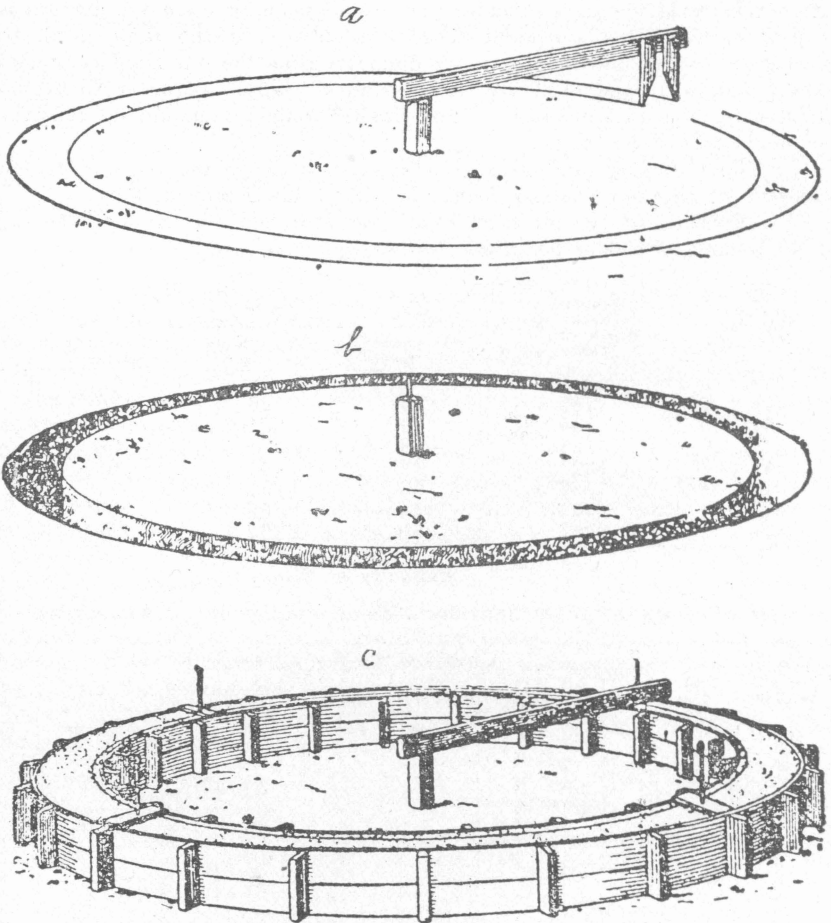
(a) Shows the method of laying off the trench for the collar of the underground silo. (b) The middle shows the trench dug. (c) The lower section shows the forms in place made of horizontal strips filled with concrete.
